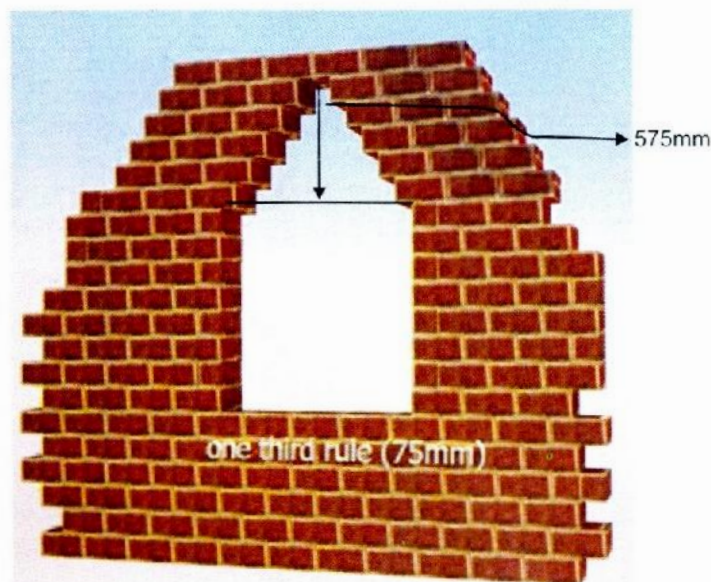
Corbelled brick cantilevered at 75mm (one third of brick length).
